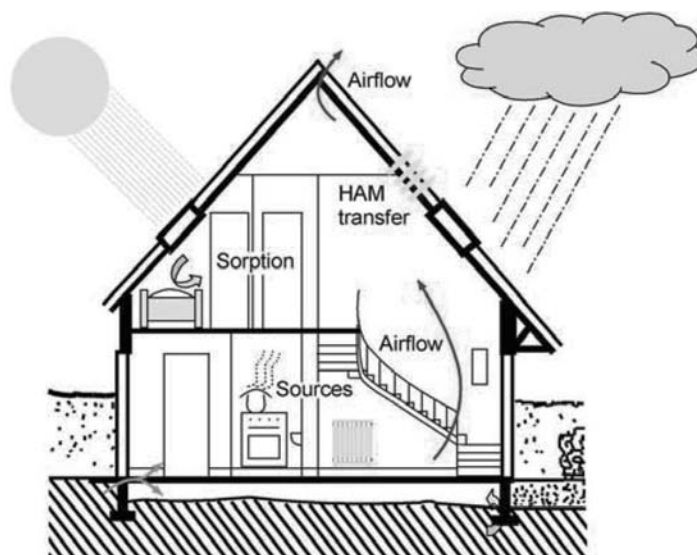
Building with indoor and outdoor hygrothermal loads [6]
